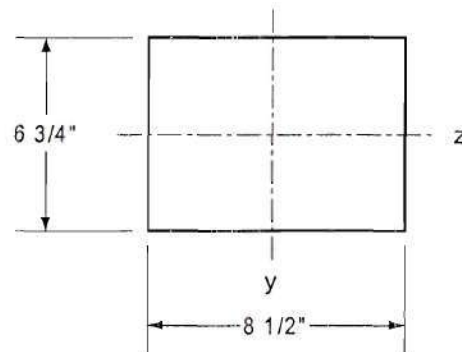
Typical 7 inches x 9 inches wood cross section
